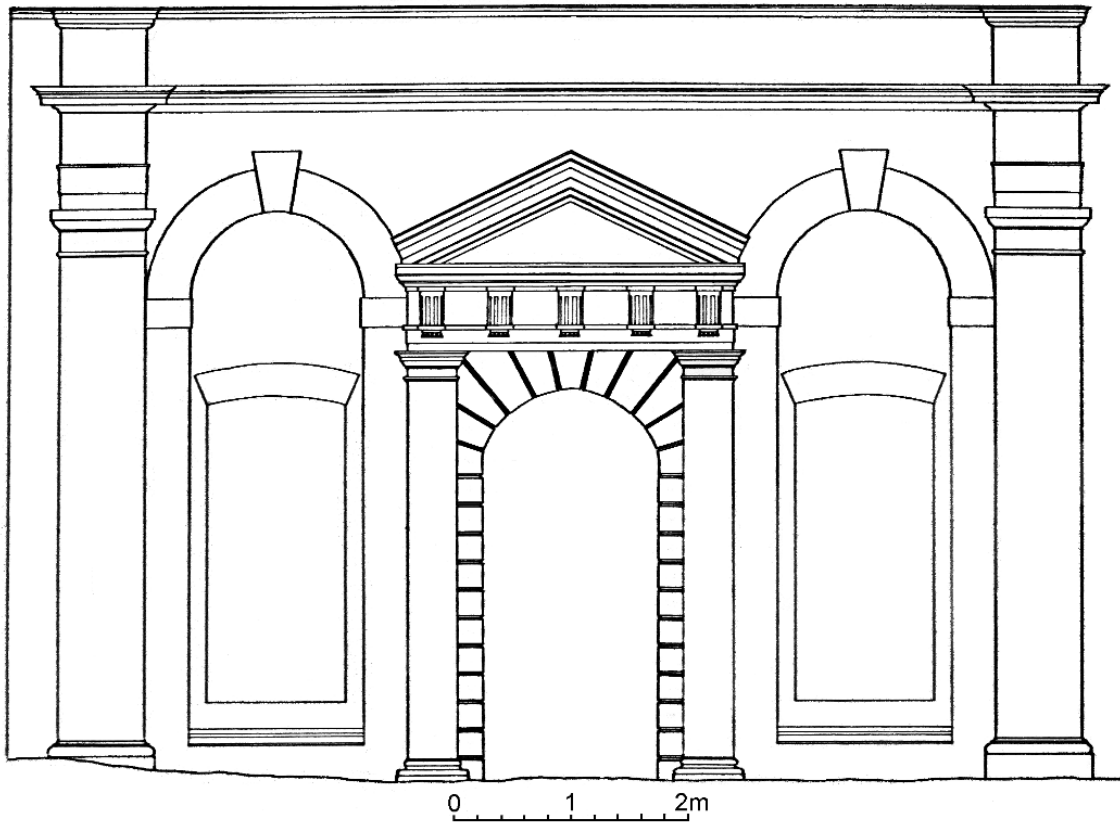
Reconstruction drawing of the orangery wall bay 1.
